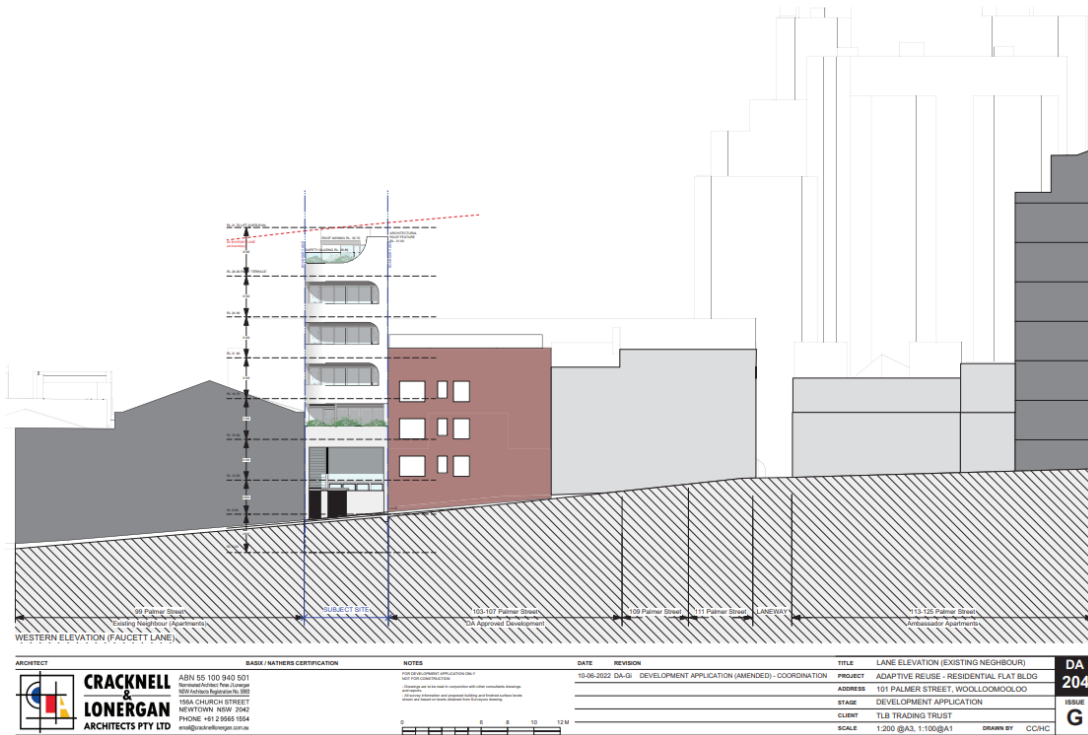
Proposed west Faucett Ln context elevation (existing development shown adjacent)
